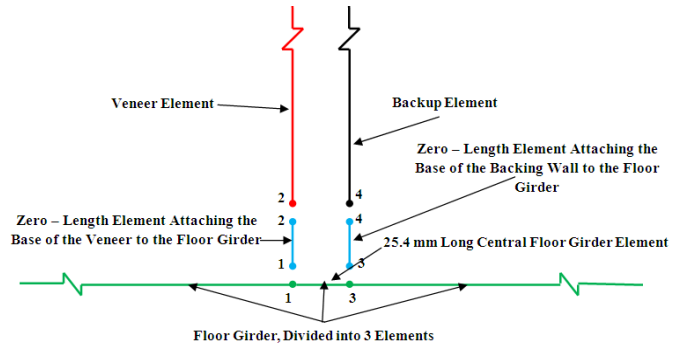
Base Attachment of CMU Backed Wall System to Frame
